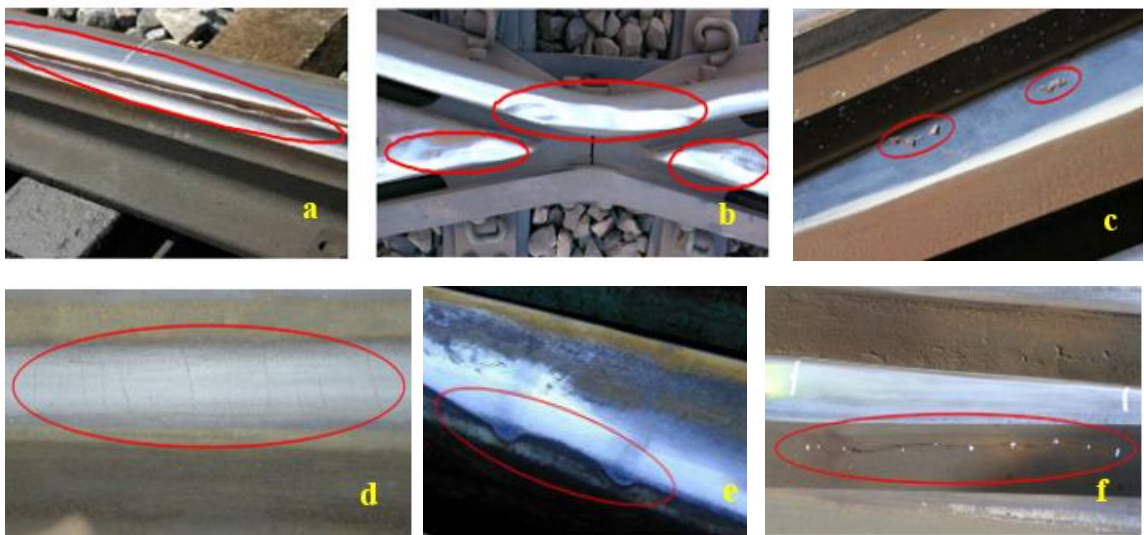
Example of damage on components: (a) part of the switch rail is detached, (b) plastic deformation and wear, (c) Spalling, (d) head checks, (e) squashing, and (f) cracks [31][159].
